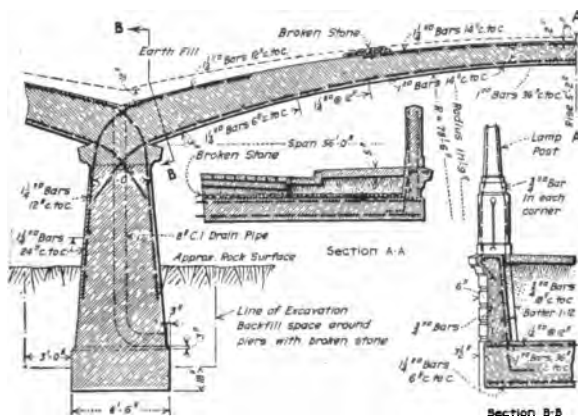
A.—Details of Pine Street bridge, Lima, Ohio.
